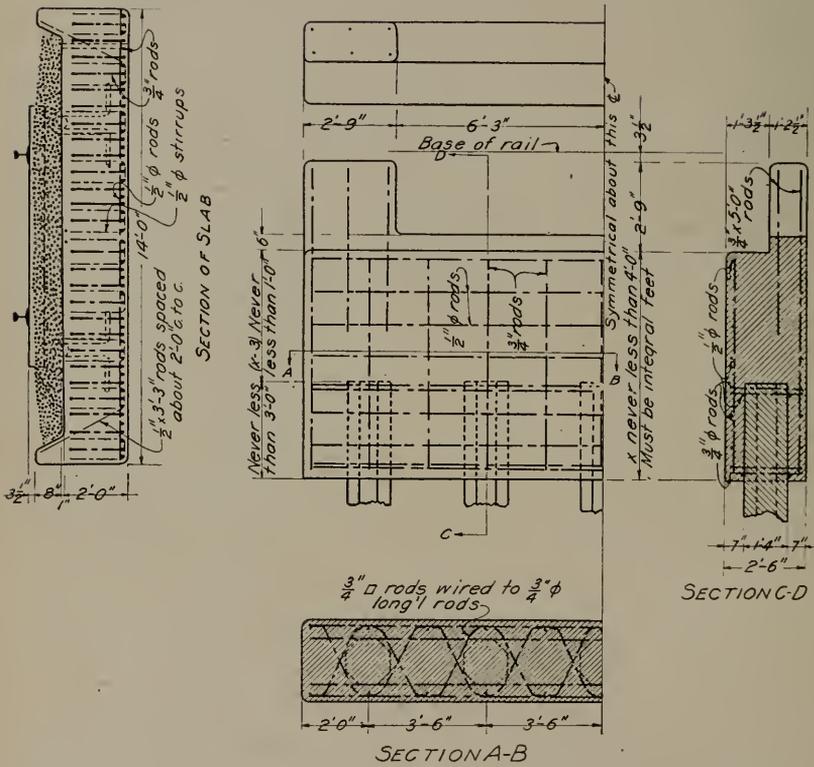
END BENT, REINFORCED CONCRETE TRESTLE—NORTHERN PACIFIC RAILWAY.
